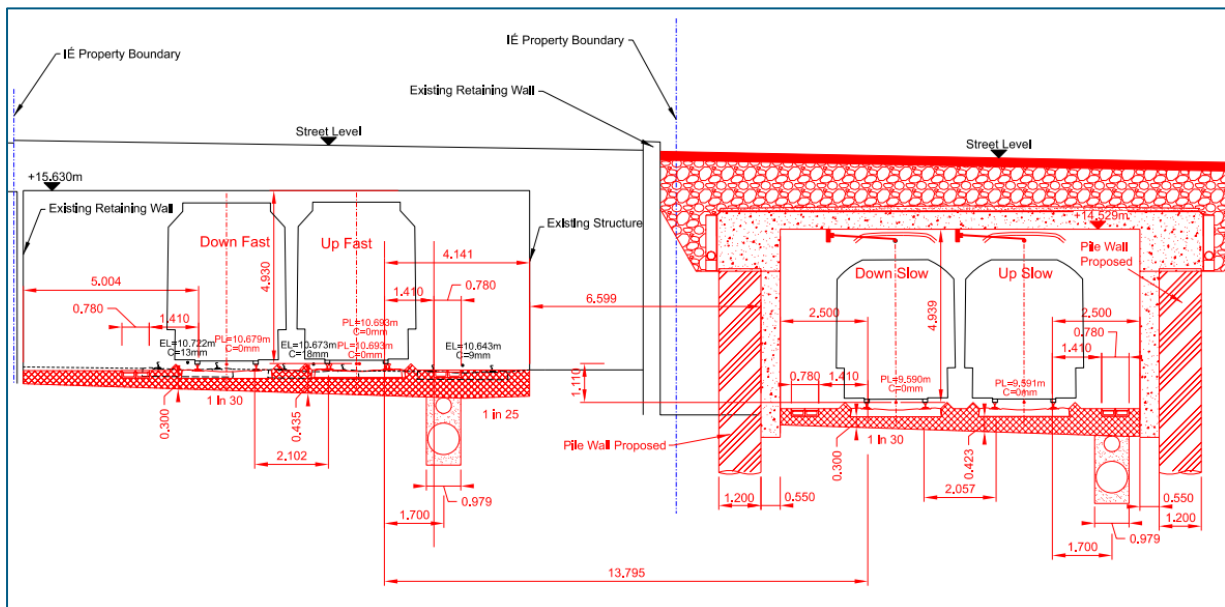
South Circular Road Bridge and New Cut and Cover Structure – Cross Section, View Facing West
